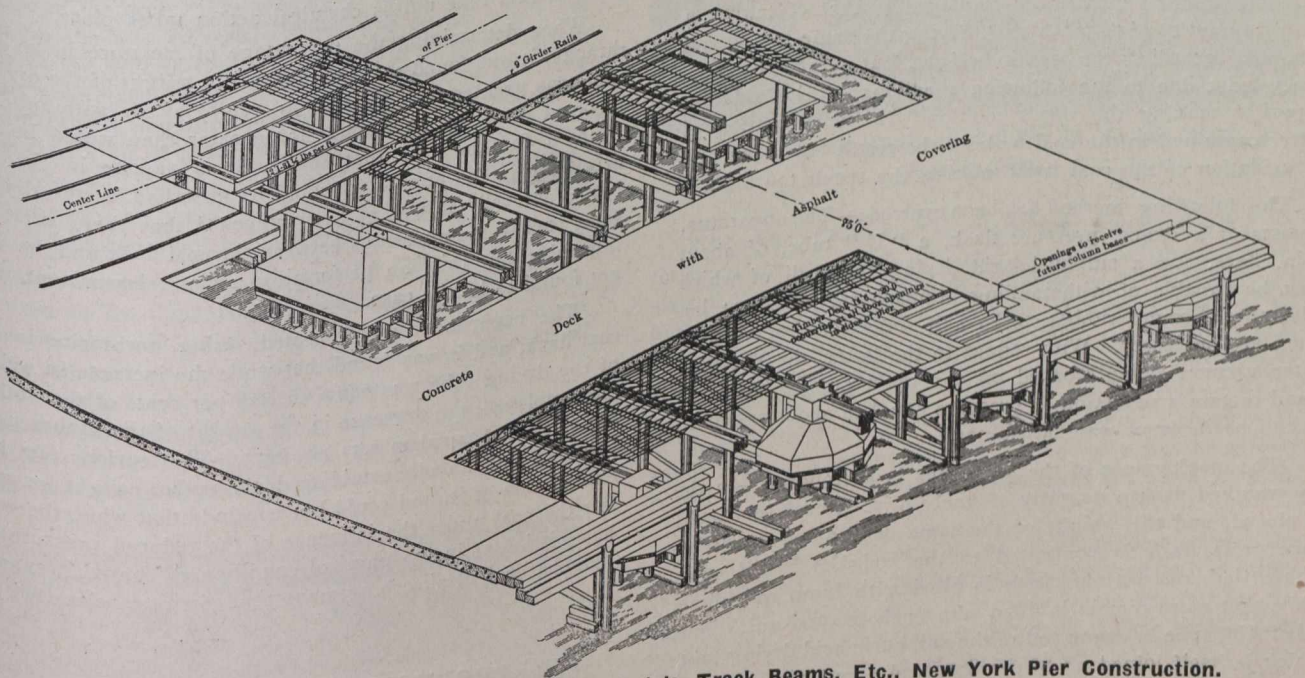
Showing Placing of Steel Reinforcement, Pedestals, Track Beams, Etc., New York Pier Construction.
